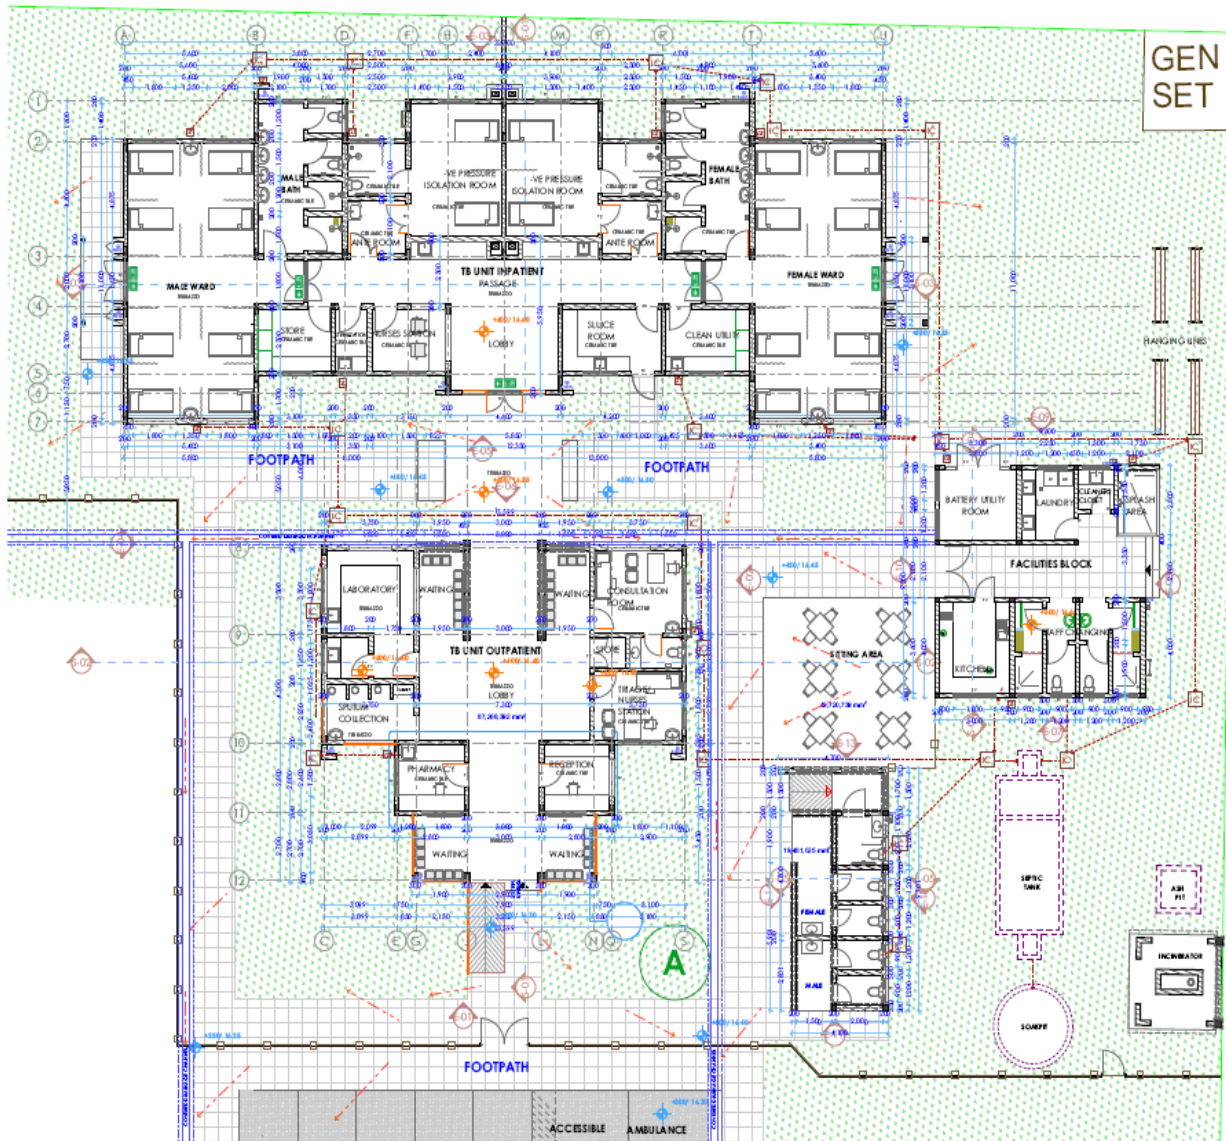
The proposed floor plan design for reconstruction of the TB Unit
